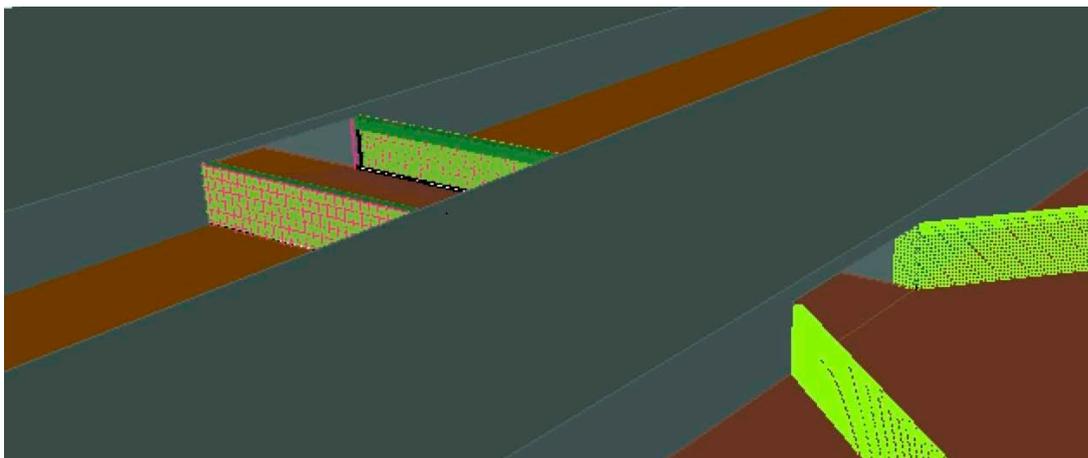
Fencing (green) leads animals into tunnel and then across opening between tunnels in the median of a divided road.
